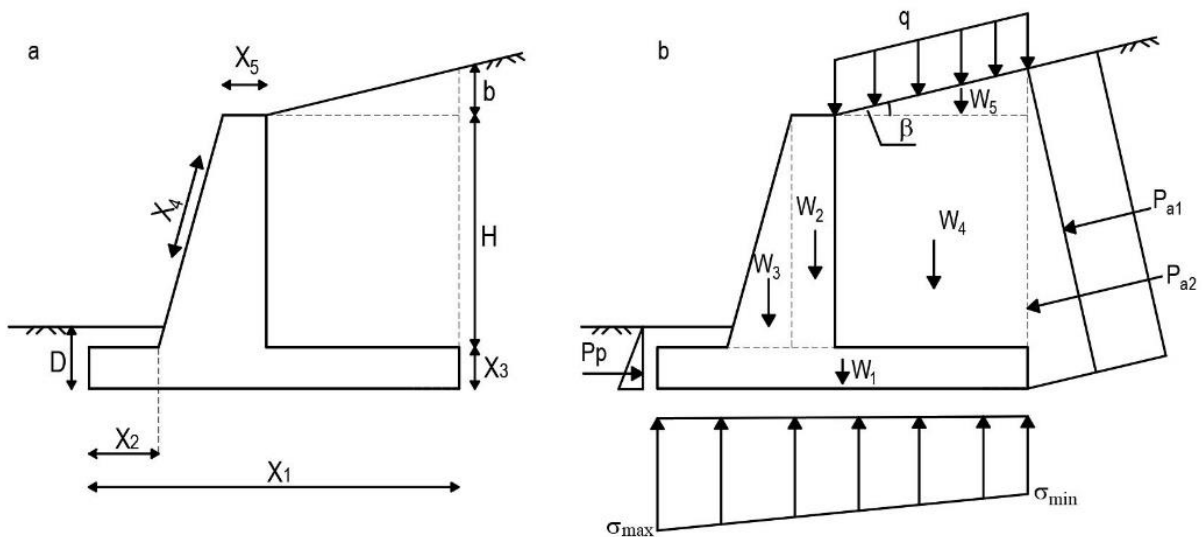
Concrete cantilever retaining wall design: (a) wall dimensions; (b) acting loads to the wall.
